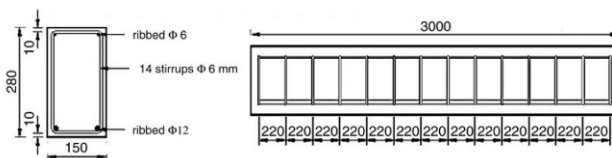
Layout of the reinforcement (all dimensions in mm) for type B beams
